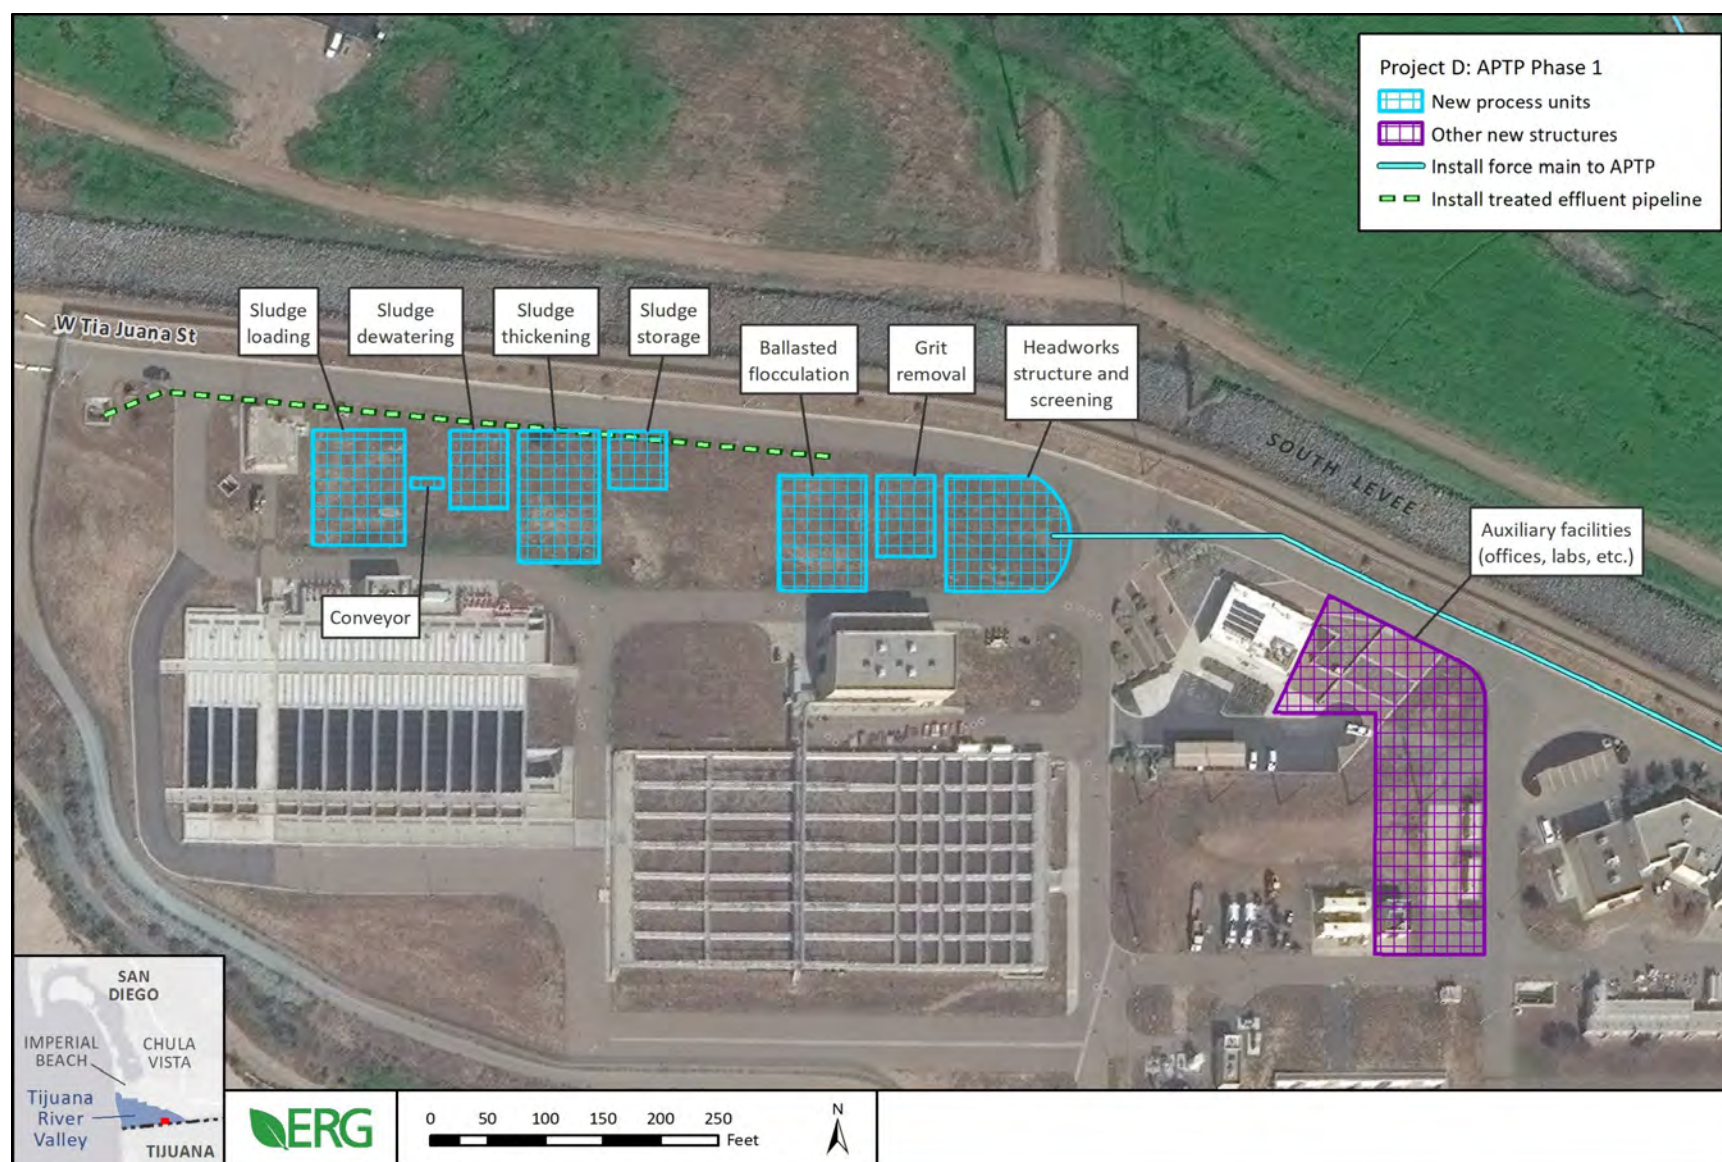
Project D (AFTP Phase 1) – Conceptual Site Plan of Proposed Facilities
